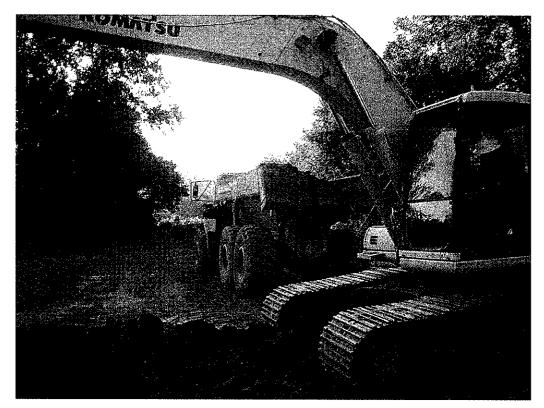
Phase II – Excavation and loading of impacted soils from Stormwater piping trench.
